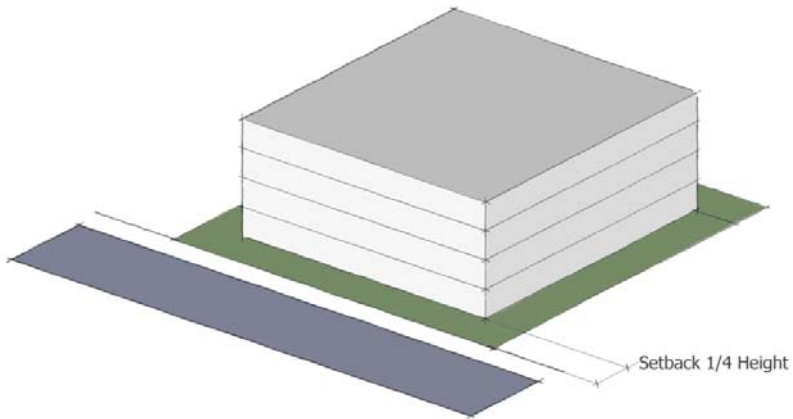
a – Setbacks for buildings greater than four storeys adjacent to a residential zone
